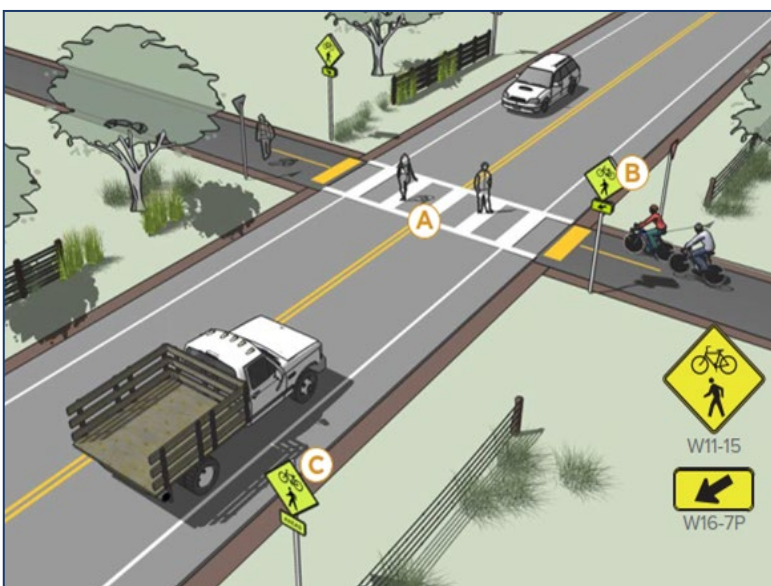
Recommended Pavement Markings and Crossing Warning Signs, from the Empire State Trail Design Guide.
